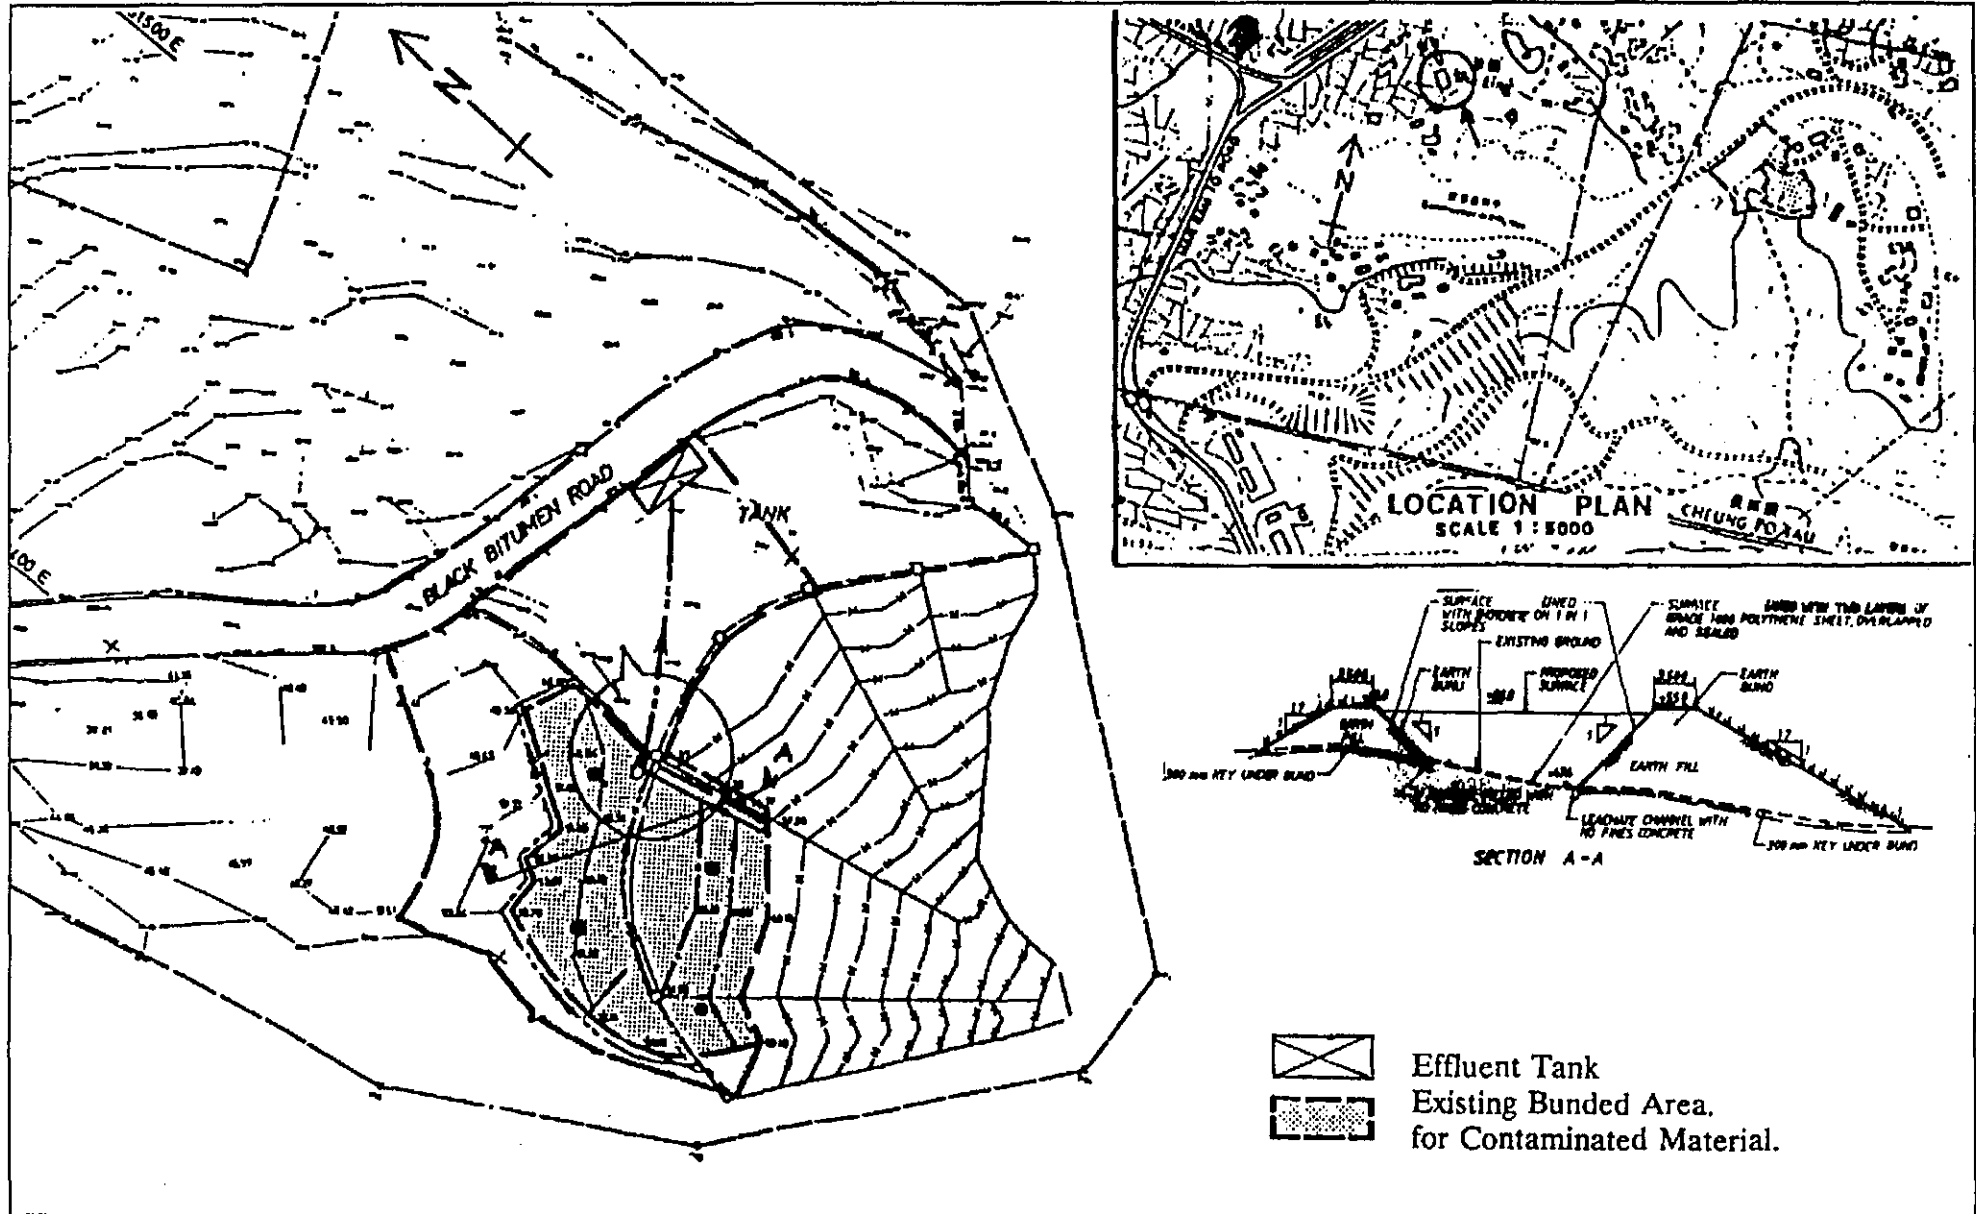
Existing Facilities at Sha Ling Borrow Area for Drying Contaminated Material
